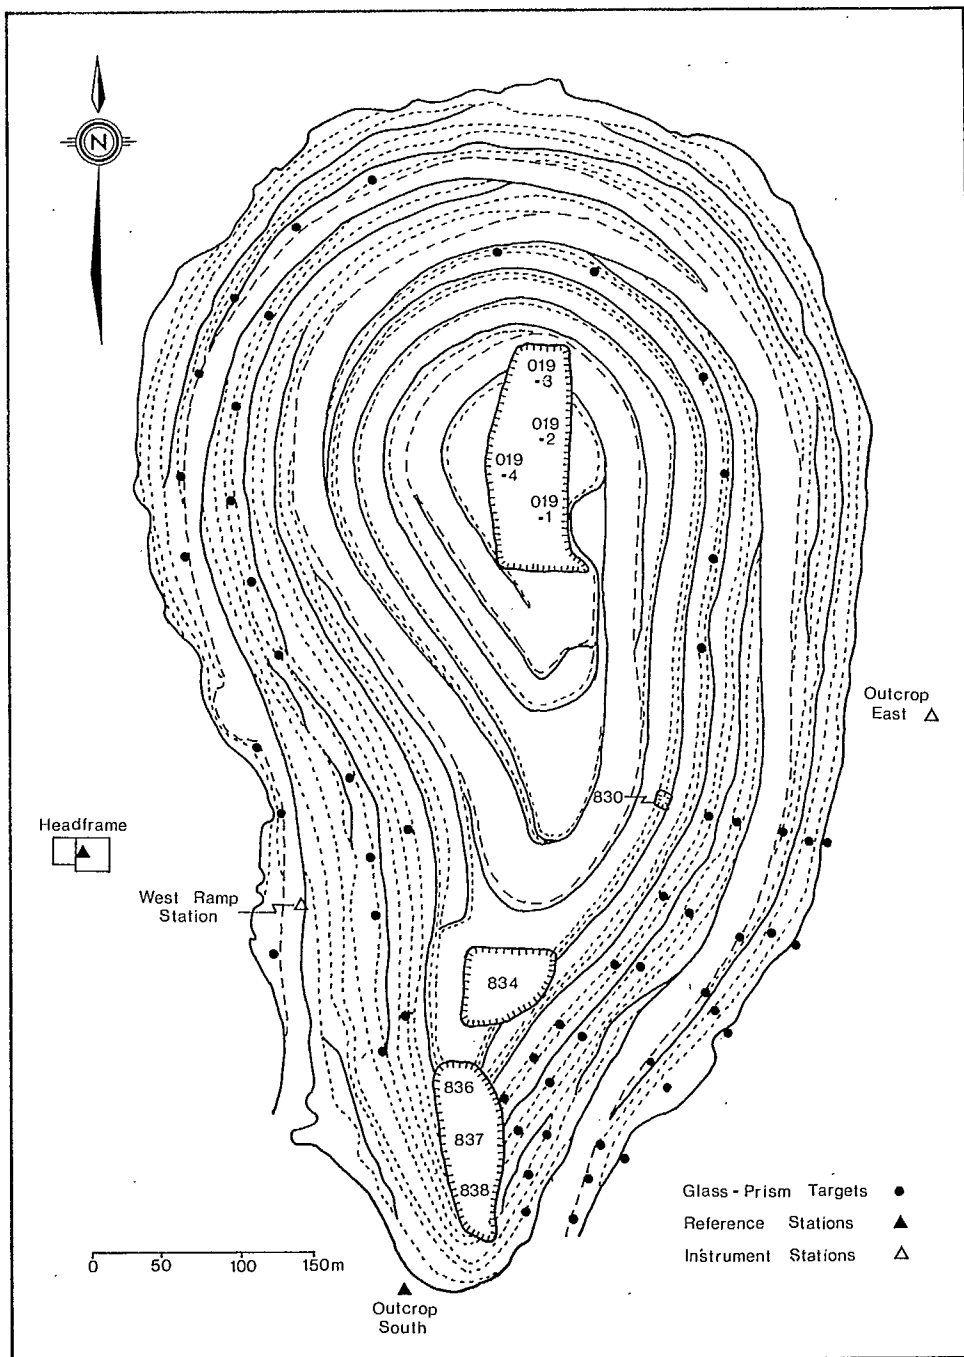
Layout of remote monitoring systems in the open pit
